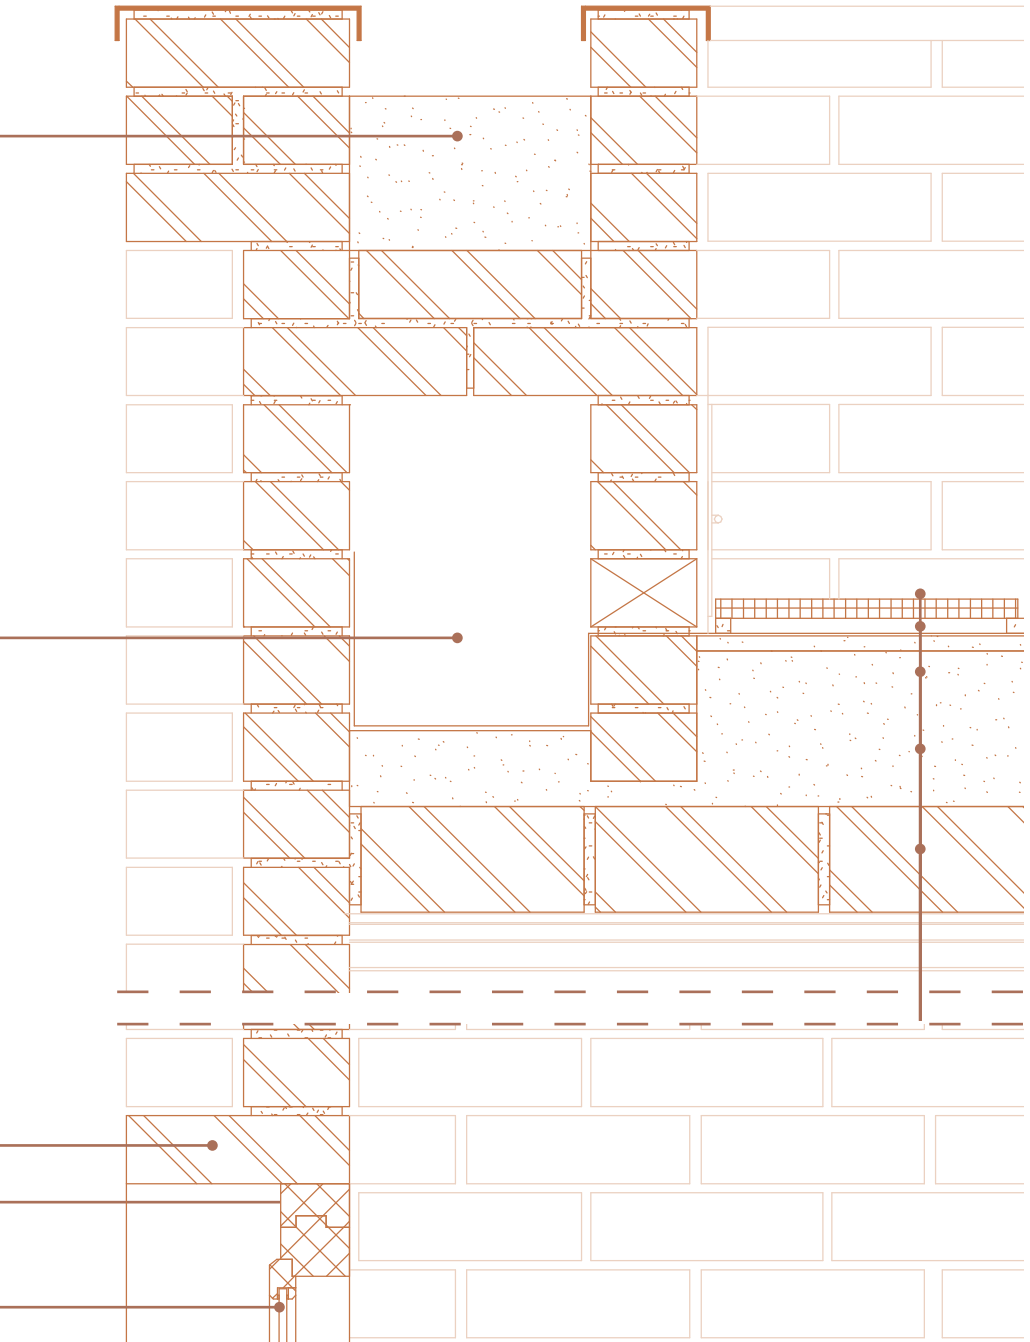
Detail Roof (accessible) [Scale 1:10]
